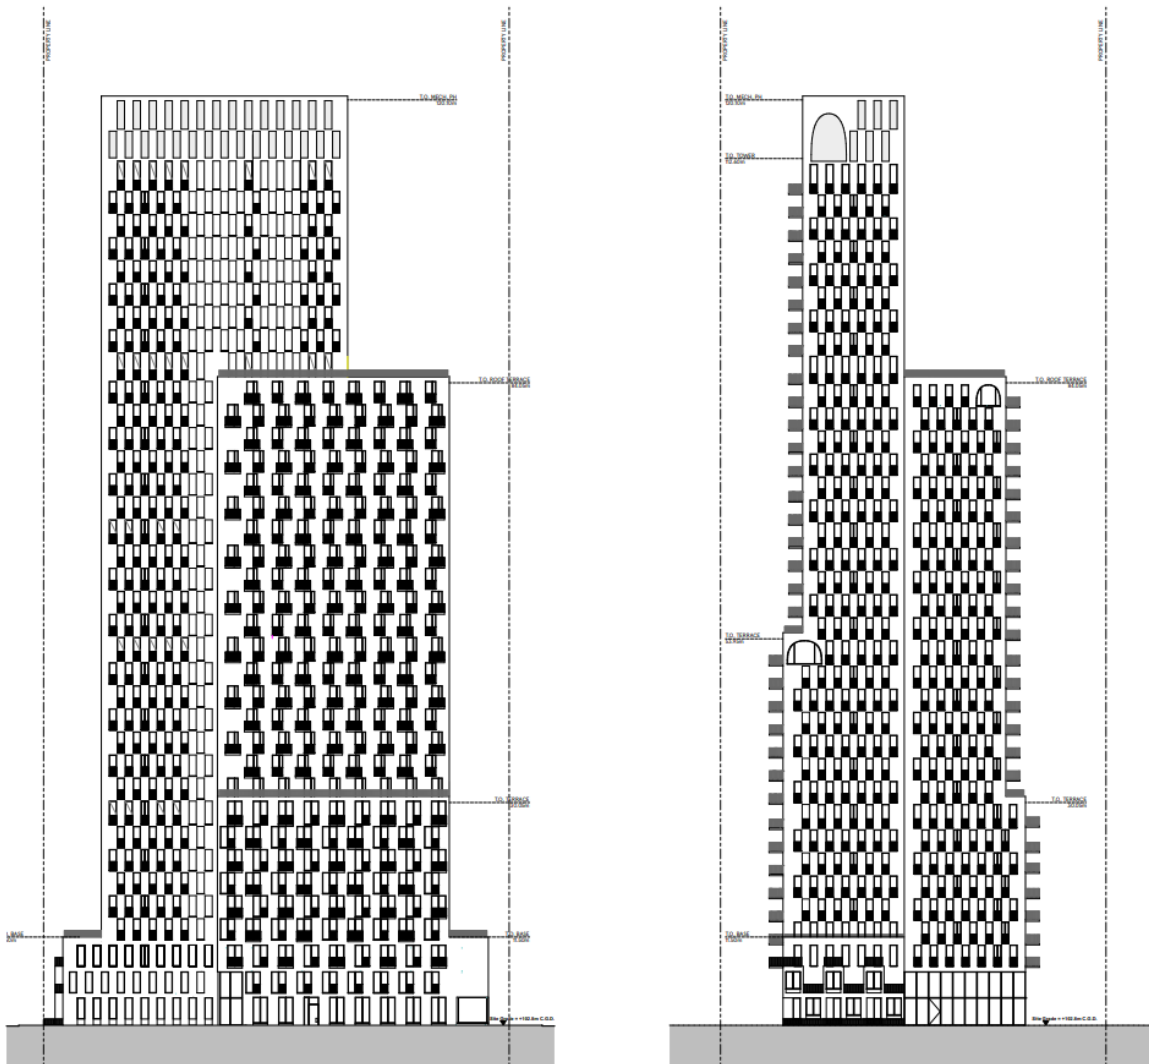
Proposed north elevation (left) and east elevation (right) of 405 Sherbourne Street (architects-alliance, Alison Brook Architects Inc., 2025).
